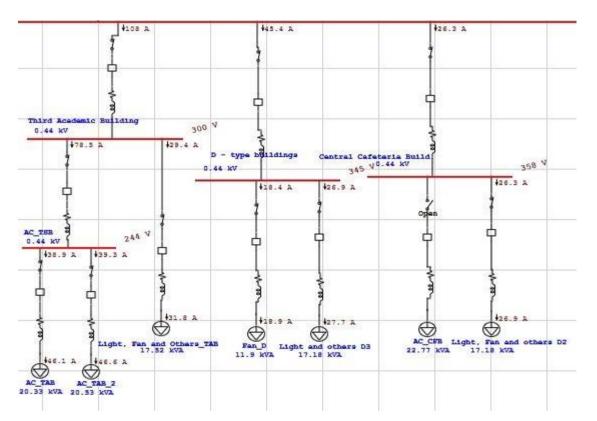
Electricity through different branches of Third Academic Building, D-type Building and Central Cafeteria Building
